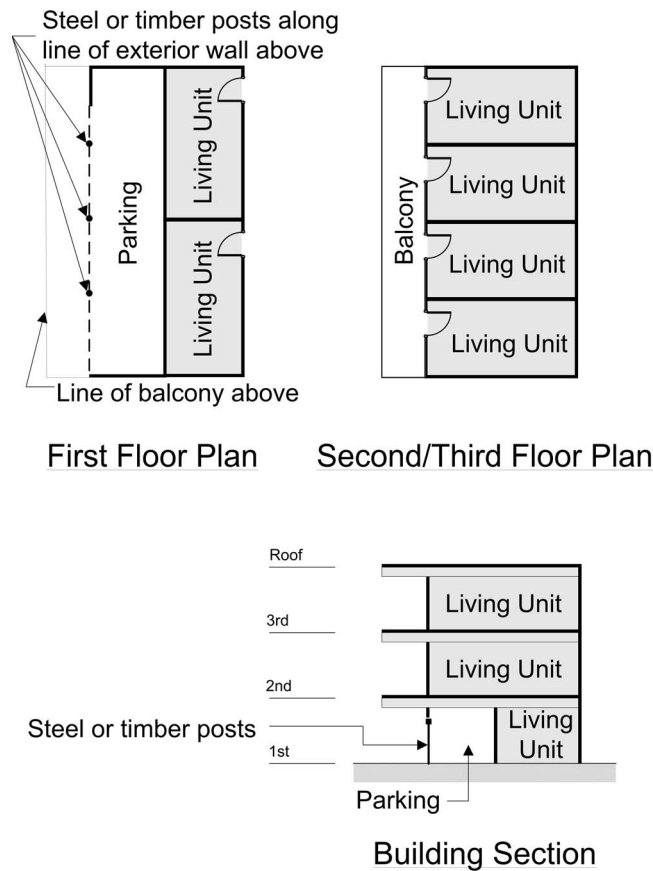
Example of soft-story multifamily dwelling construction with tuck-under parking.
